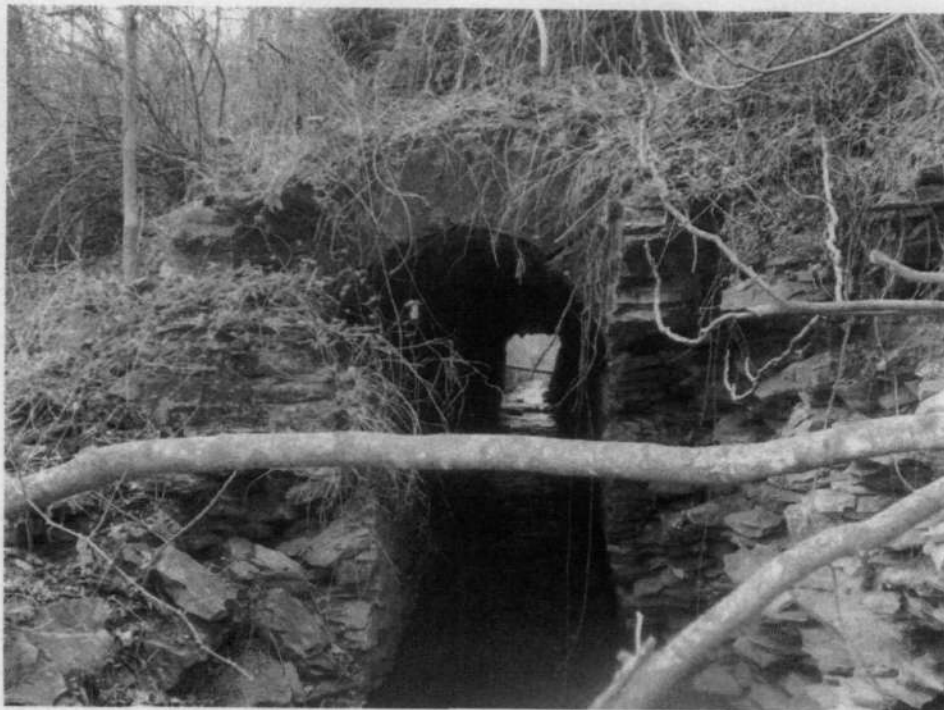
Close-up View Showing Repaired Arch on the East Elevation of Culvert 67.18
